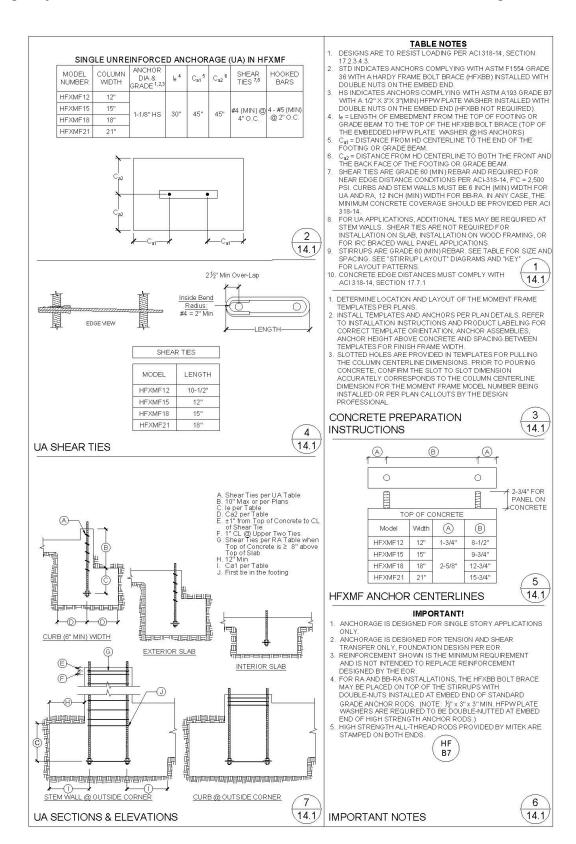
PORTAL FRAME ANCHORAGE DETAILS
